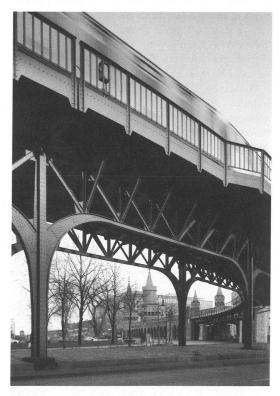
Viaduct of the line 1 of the subway in Berlin-Kreuzberg, completed 1902, a filigran truss girder system
